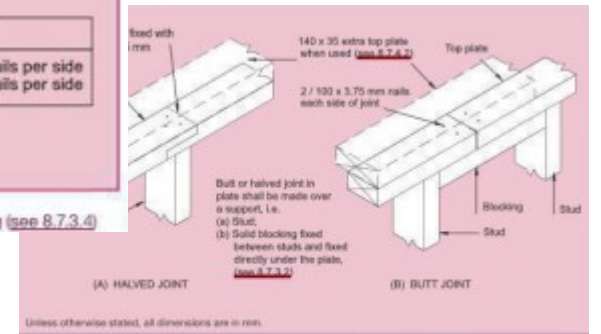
Connecting top plates - Walls not containing bracing (see 8.7.3.2)
